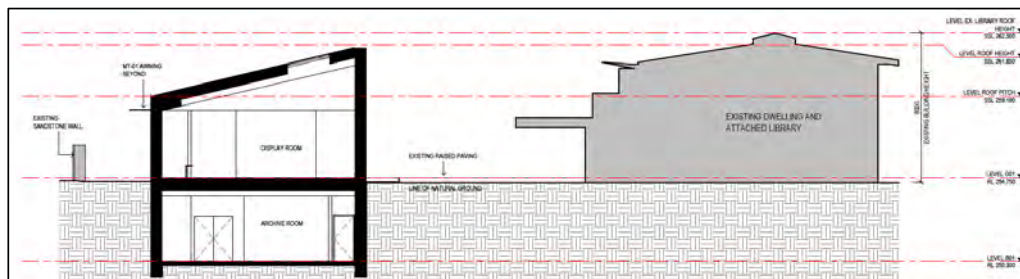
Section 4 showing height, setbacks and relationship of the new building to the dwelling/library.
